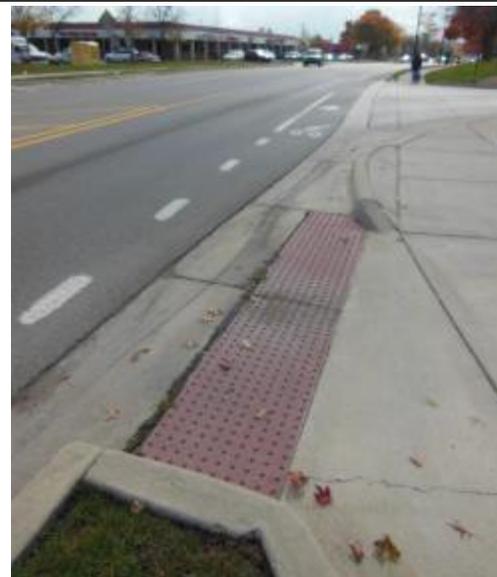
View of ramp to crosswalk at exit lane with bike ramp in background
